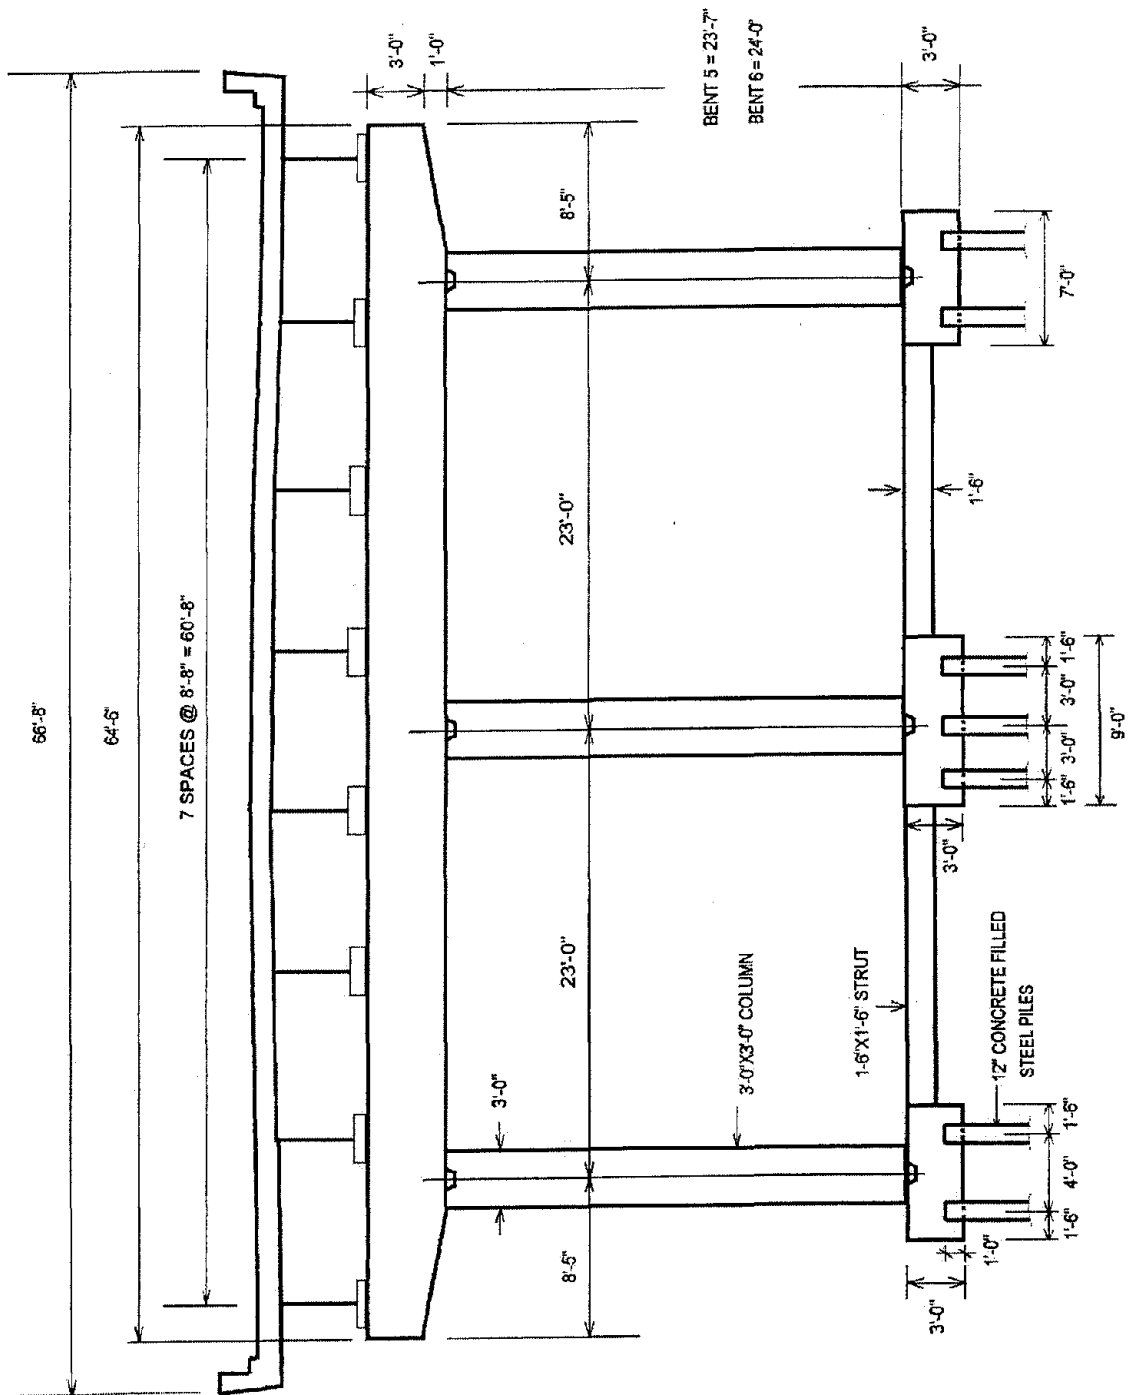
Elevation of Bent #5 and Bent #6 of South Temple Bridge at Interstate 15
